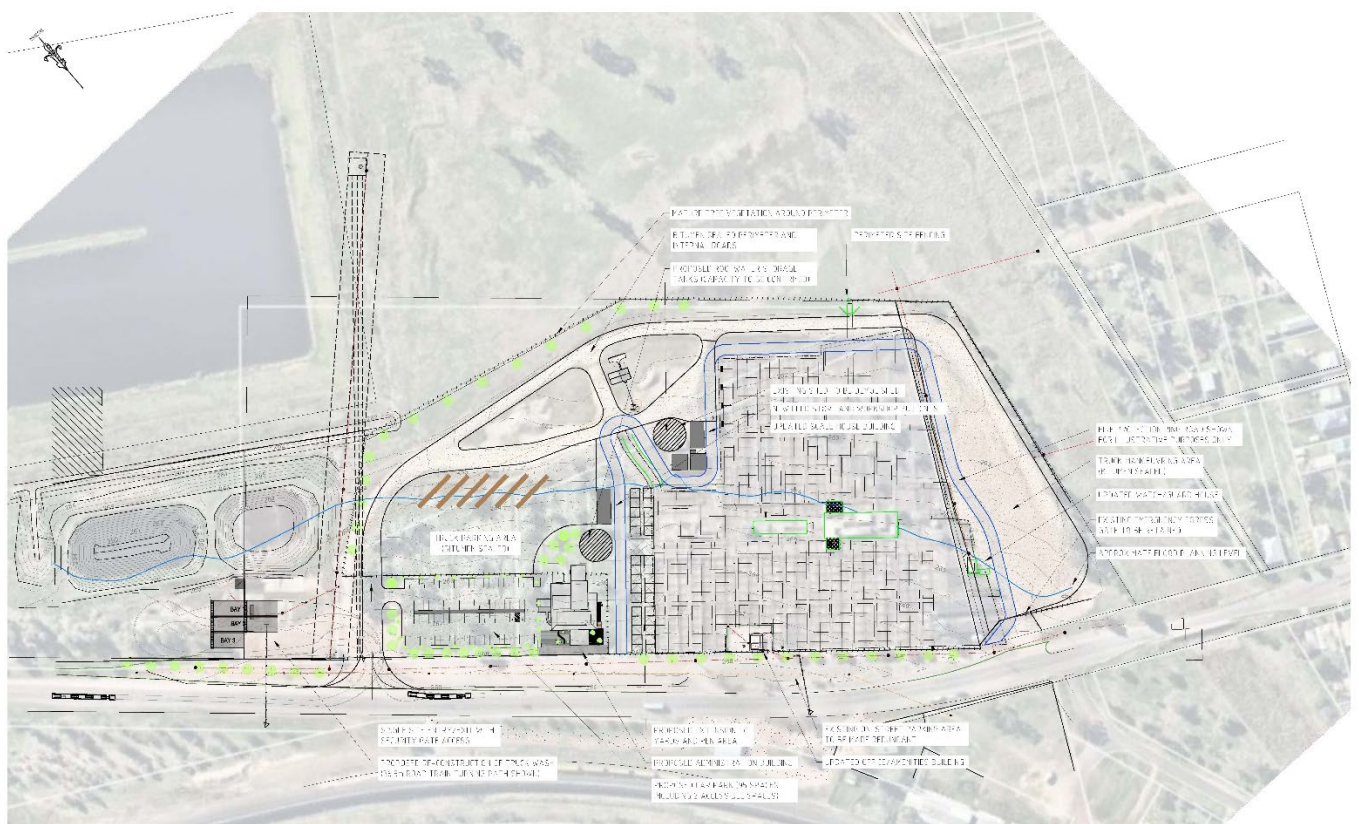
Site Plan of the Proposed Redevelopment – aerial overlay (Kelley Covey)
